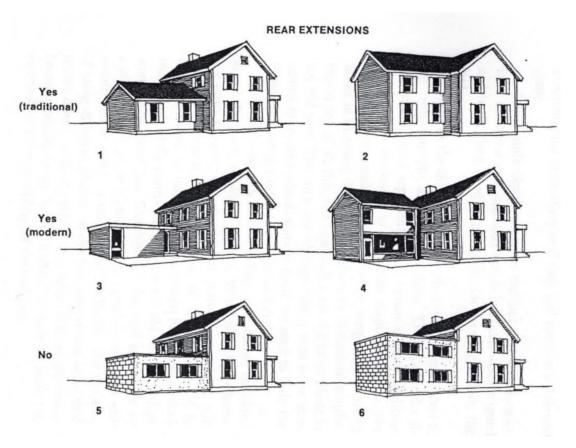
General guidance for adding "rear extensions" to a heritage building (from Stephen 1972:108).
